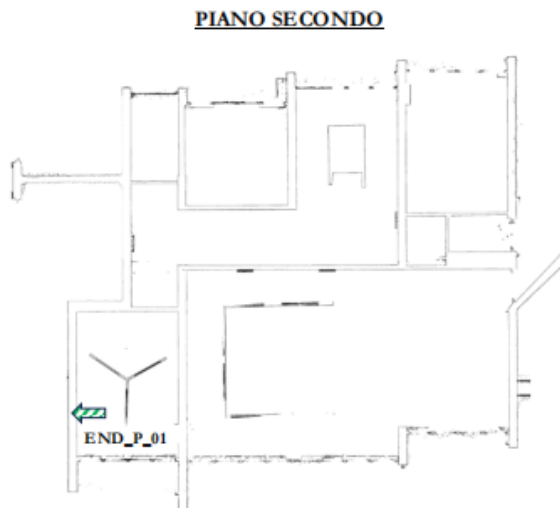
Location of investigated walls on the second floor (END\_P\_01)
